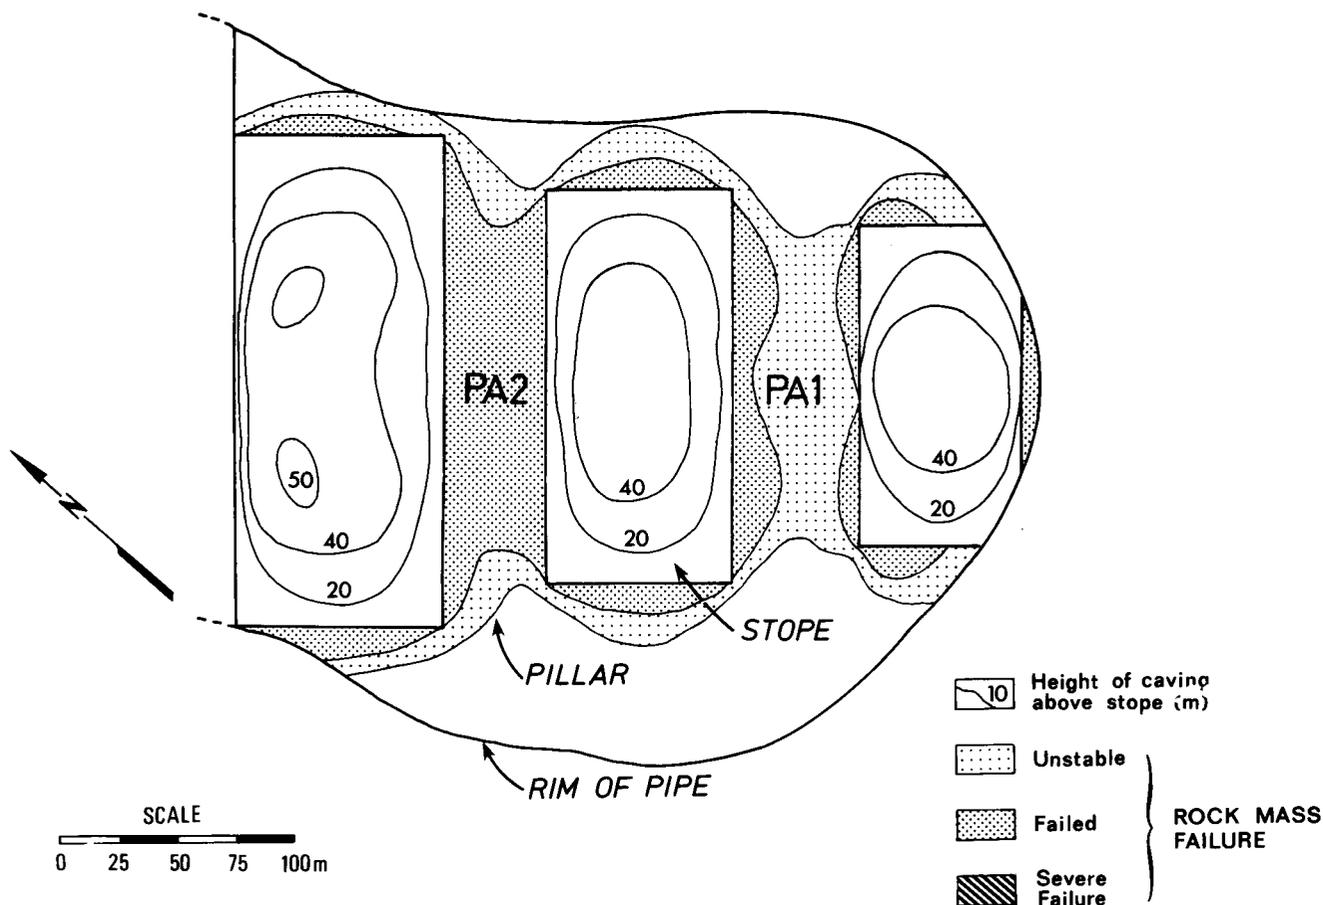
Plan showing the predicted failure of the rock mass and the height of caving above the stope roof
